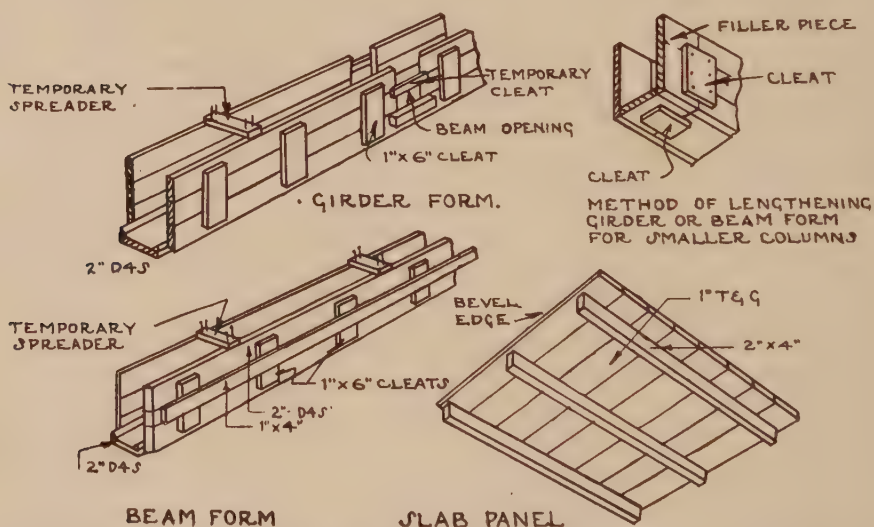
Beam-and-girder construction showing slab and beam-and-girder forms for use when the forms are removed as a unit. Figure 198 shows these forms assembled.
